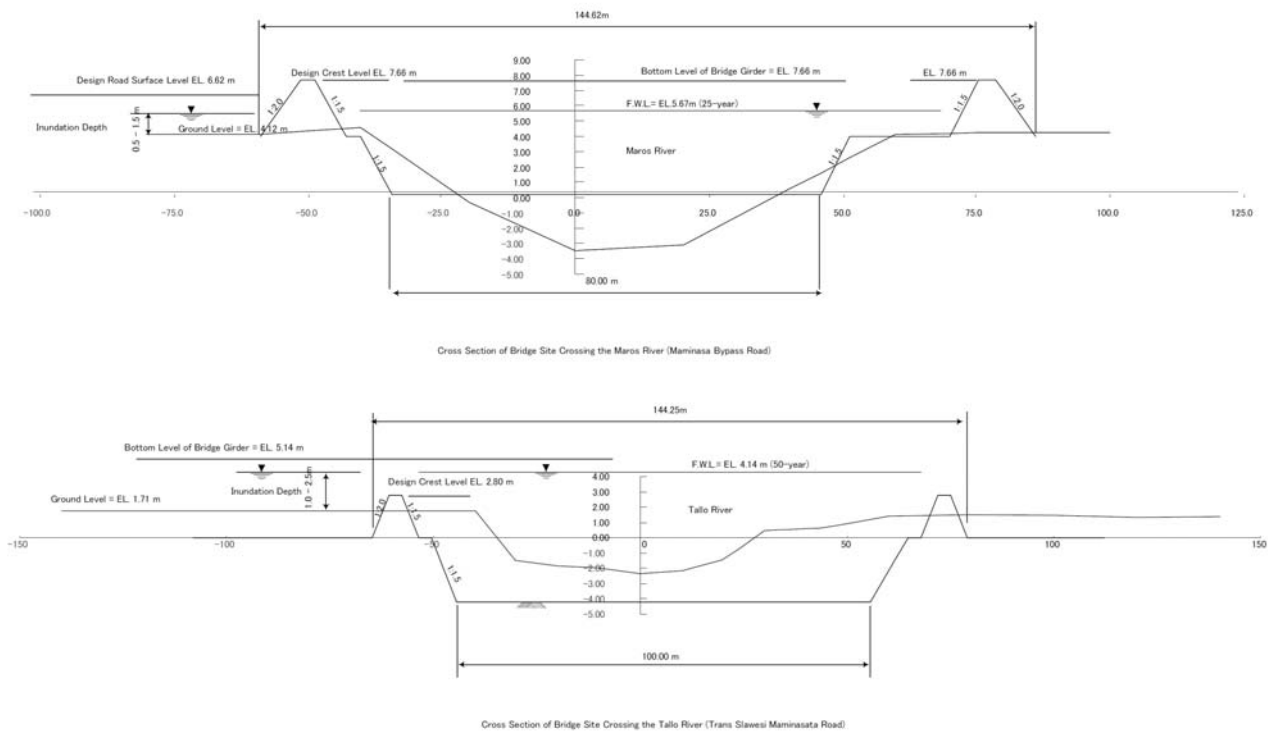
Section of Proposed Bridge Site over the Maros River and Tallo River
